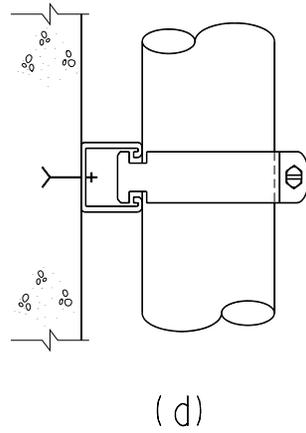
Wall Mounted Strut with Pipe Clamp
